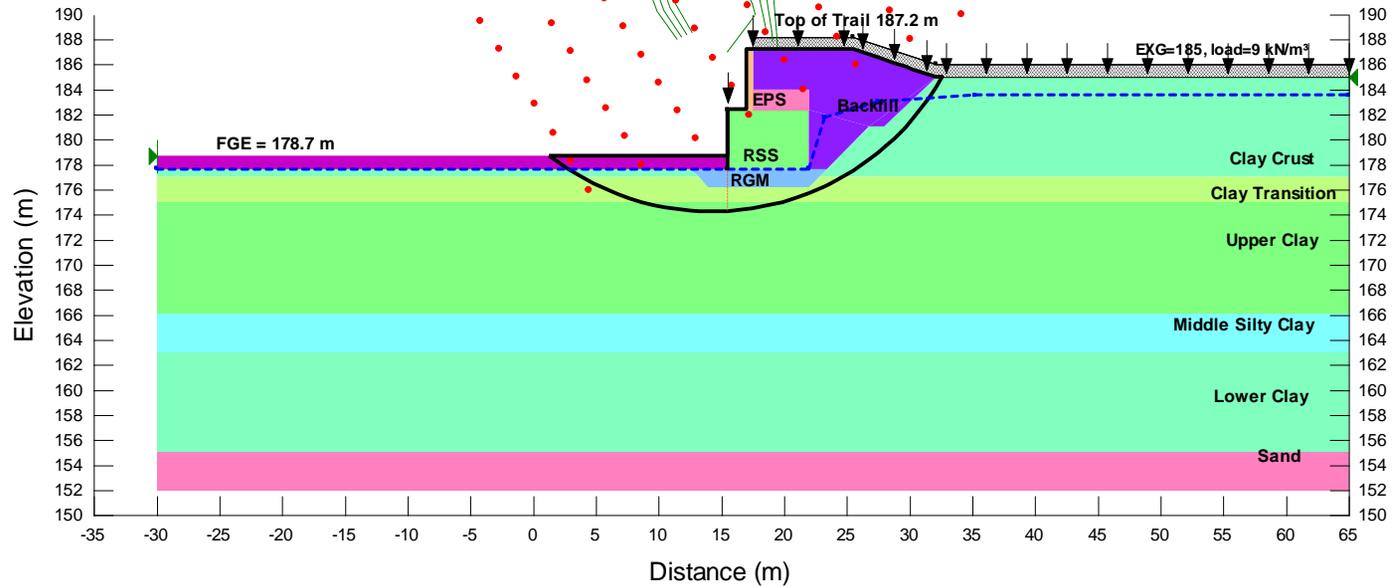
Global Stability Result – North Abutment Sta. 40+915 – Short Term (Undrained properties)
